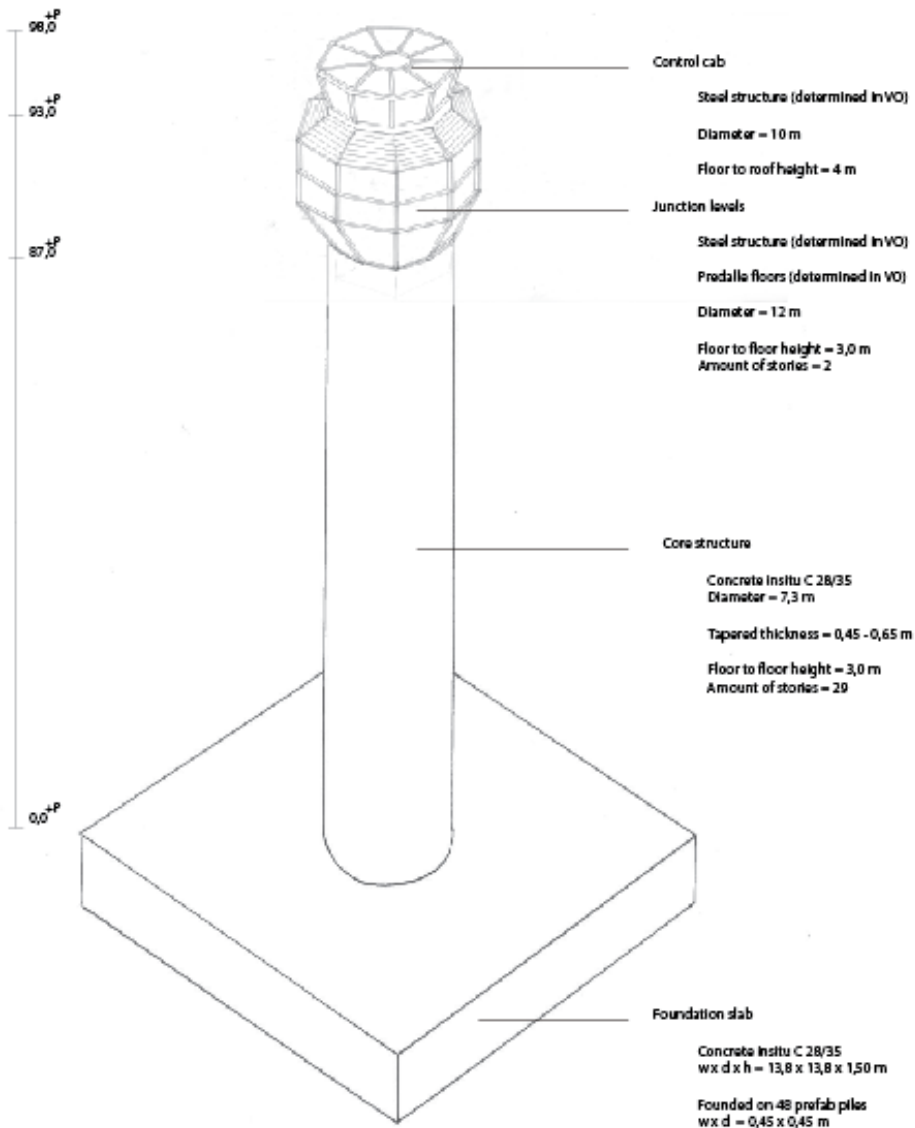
Concept design Nanjing airport: Tapered concrete core in-situ
